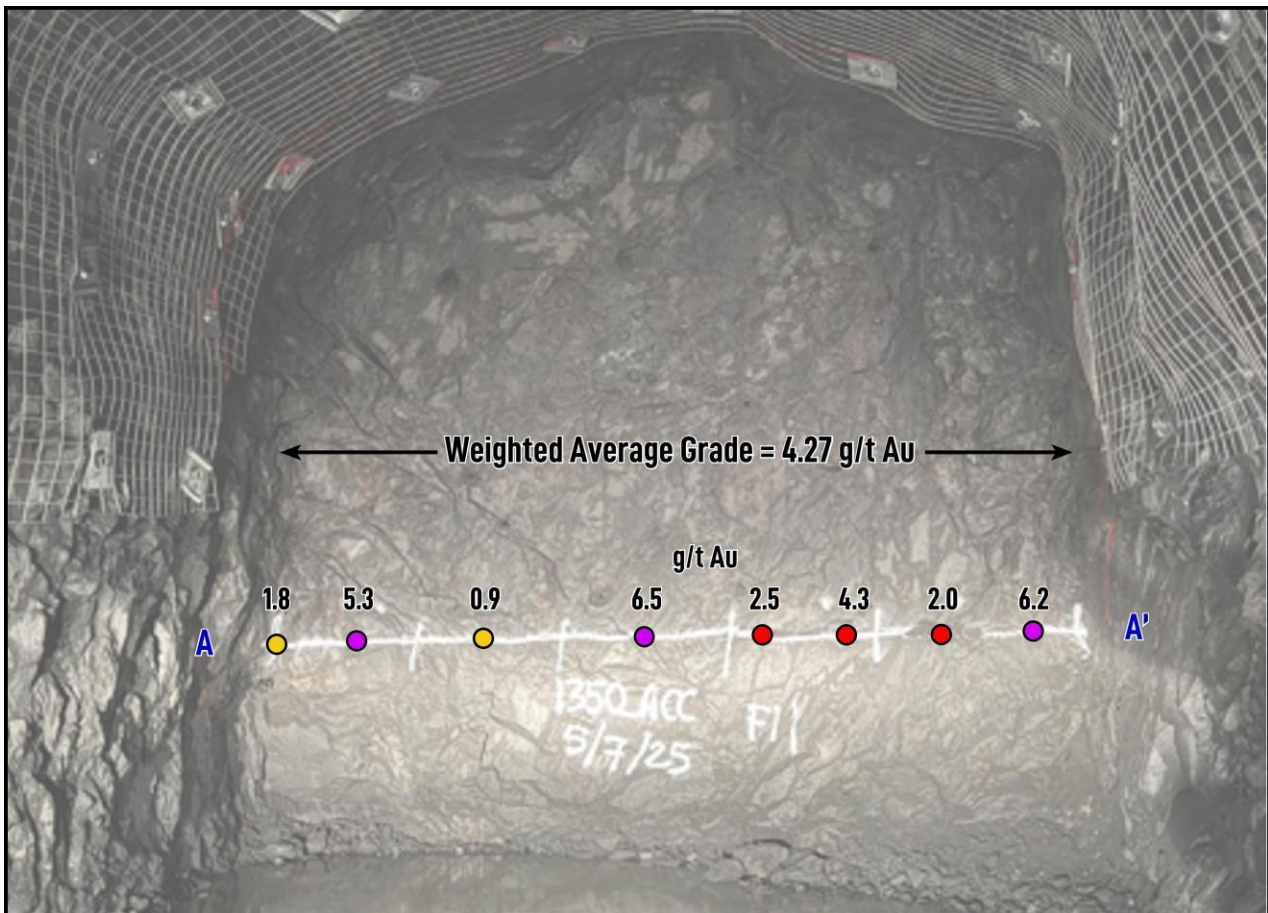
Section of face samples from the 1350 Level Access (face width ~5 metres)
